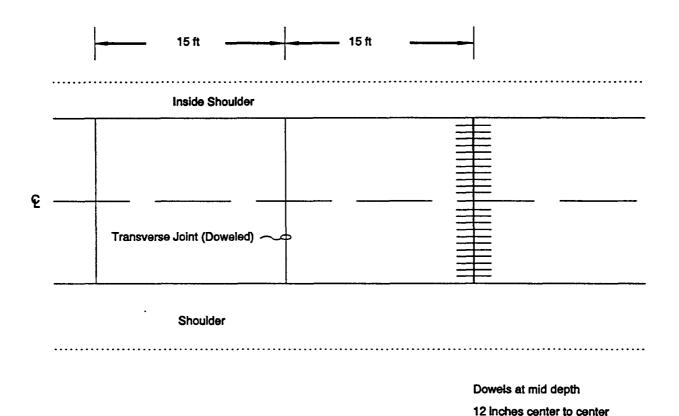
Joint spacing and dowel locations for rigid pavement test sections
